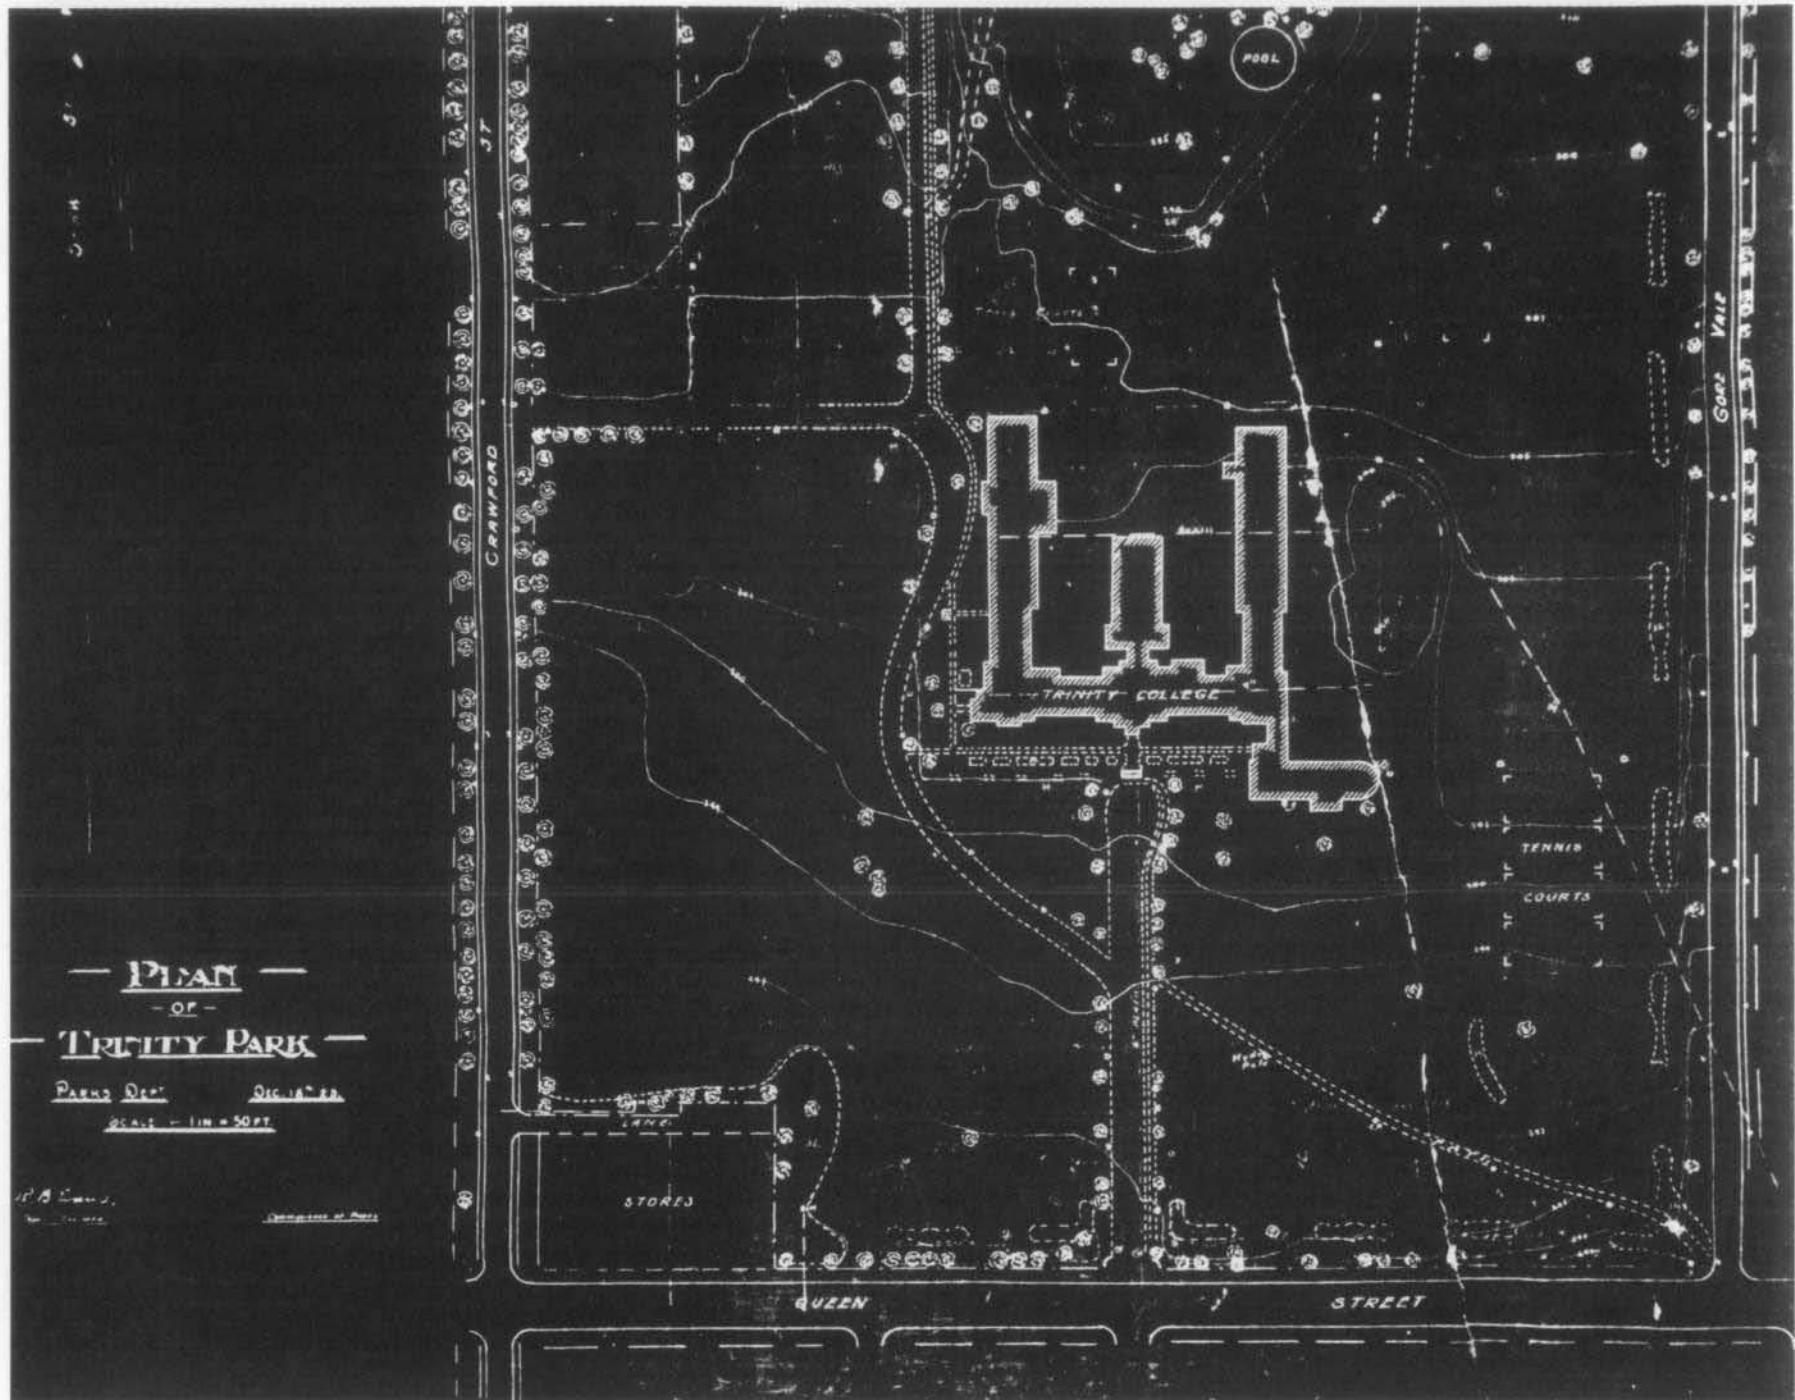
Kivas TULLY and Frank DARLING, Trinity College, Queen Street, Toronto, 1852-91, plan of College and grounds, 1923. Coll. Trinity College Archives.
